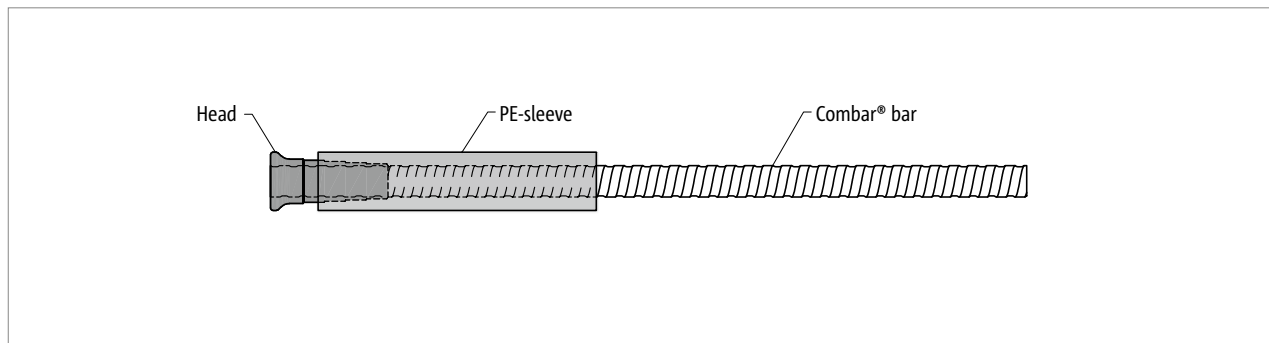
Schöck Combar® erection support for precast elements: Combar® single-headed bar with sleeve
